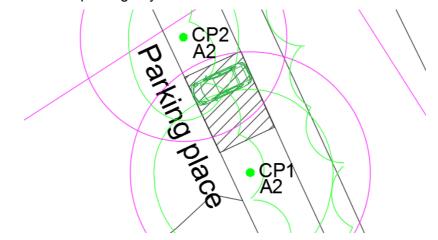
Parking area hatched at the side of the southern access road. Mitigation / Countermeasure: A conventional constructed parking area would damage surface roots, however if the parking bays are constructed using a low impact and limited excavation specification (such as the above ground Terram type method shown in Appendix 6) any significant impact can be avoided. All ground preparation prior to instalment must be undertaken by hand and without necessity for larger machinery that may cause root damage and compaction.
